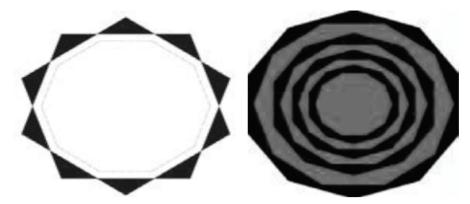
&10: Dome plan with dummy base (right) and dome plan with a multiplying rule (Source: Saeidian 2011)
